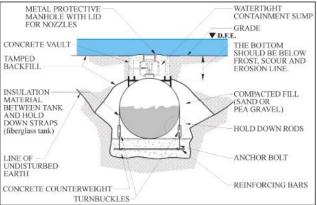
C: An underground fuel tank anchored to a concrete counterweight
